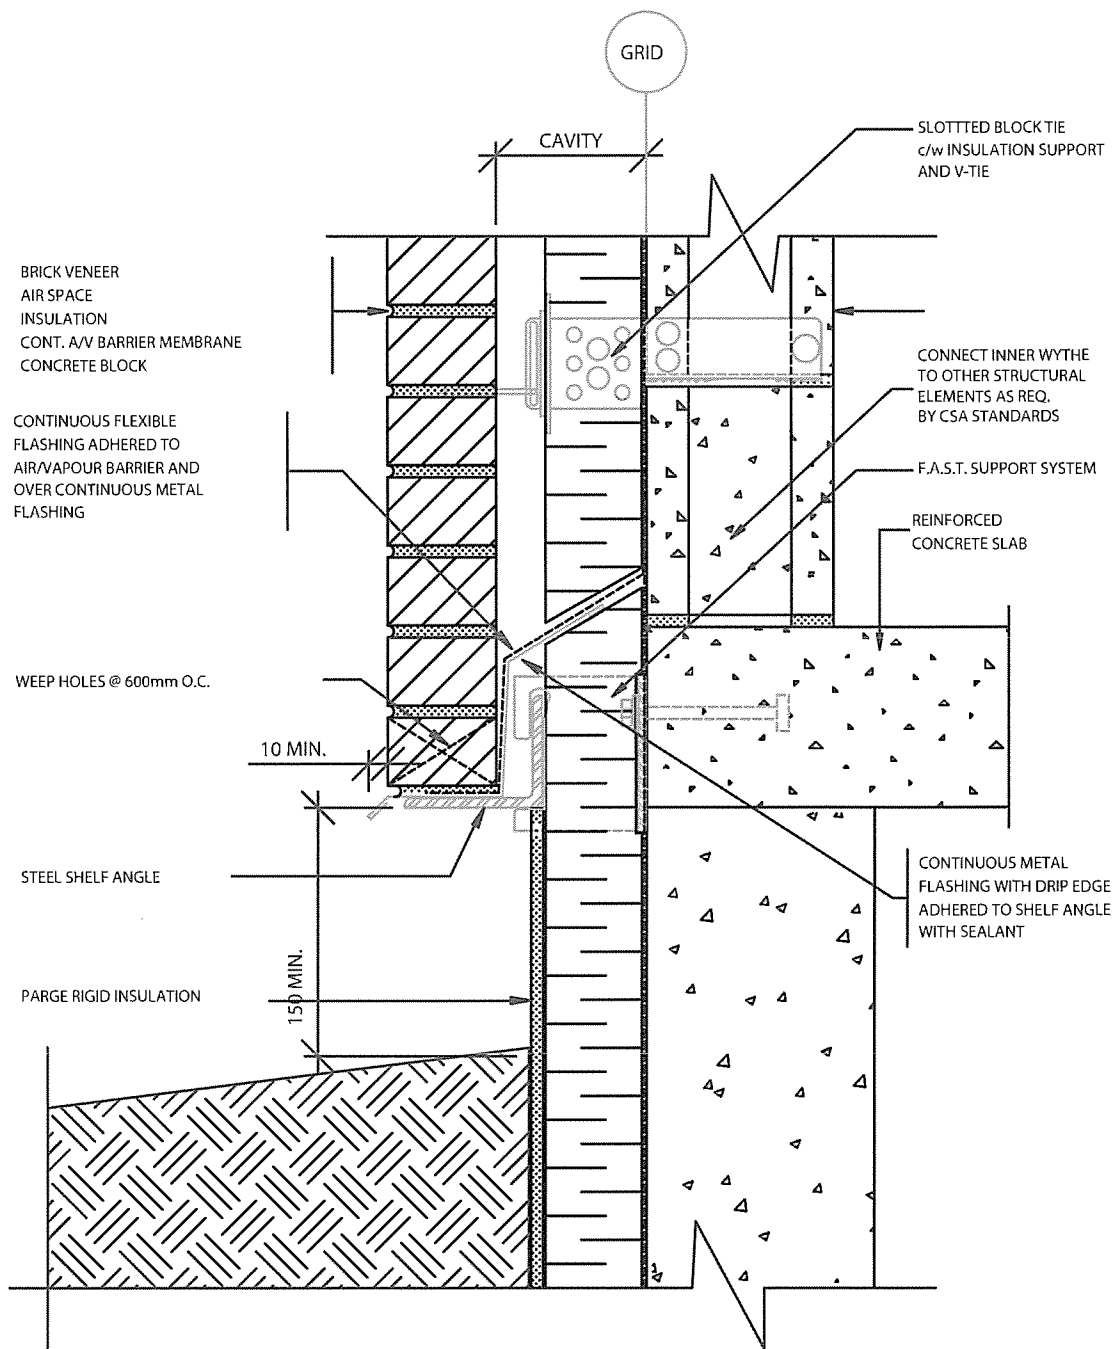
BRICK VENEER/CONCRETE BLOCK DETAIL AT FOUNDATION
